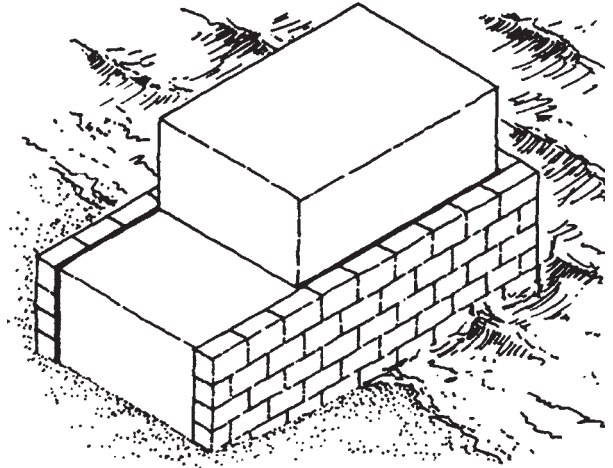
Category 3 form, stage 4, after Vitruvius 5.12.4: "Next, a concrete block (pila) of the appointed size must be built there, on this levelled surface, and when it has been formed it is left at least two months to cure" (C. J. Brandon).
